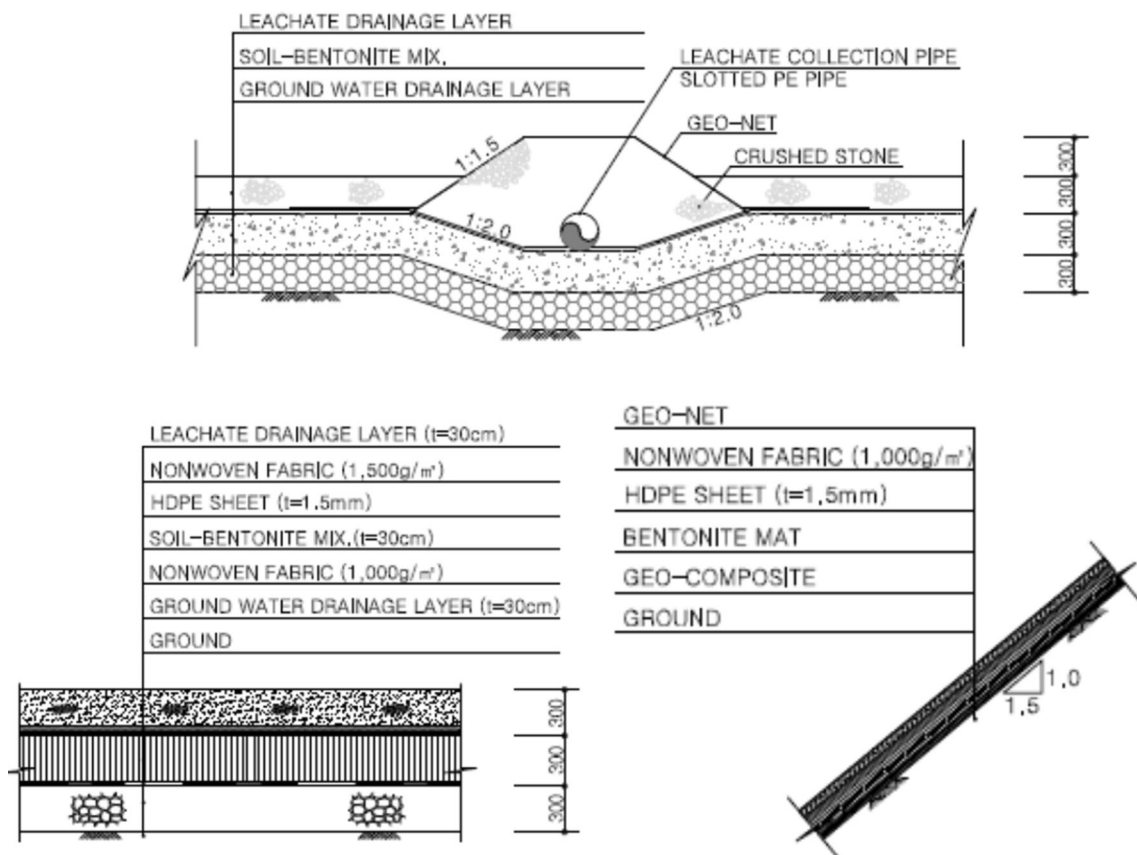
Leachate collection and drainage installation plan (Source: DOHWA Engineering Co Ltd et al. 2014)
